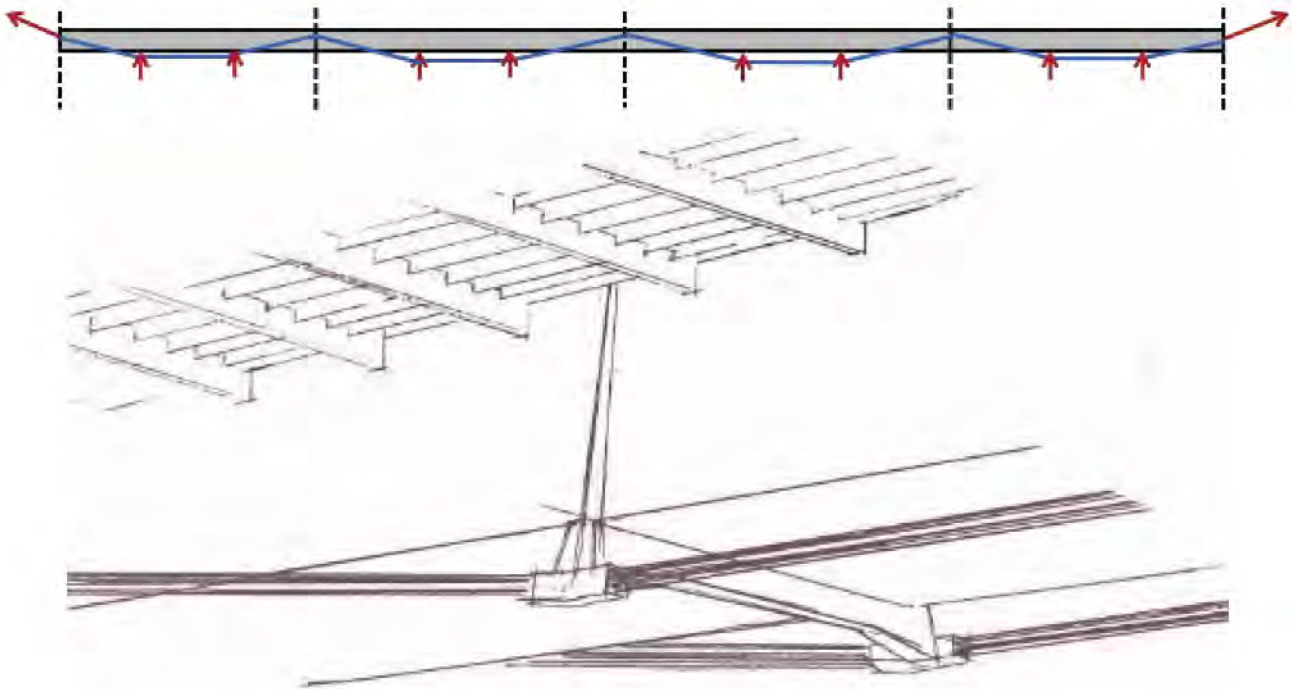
External prestressing to avoid temporary shoring ©Baumann+Obholzer
